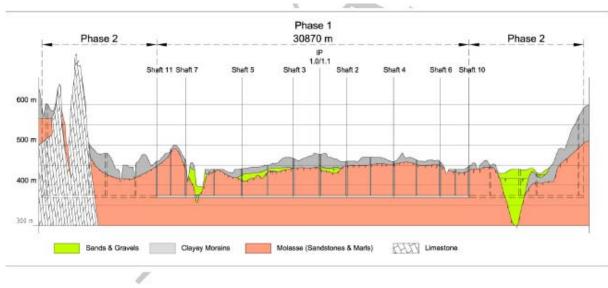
Longitudinal Profile of the European Sample Site near CERN.
